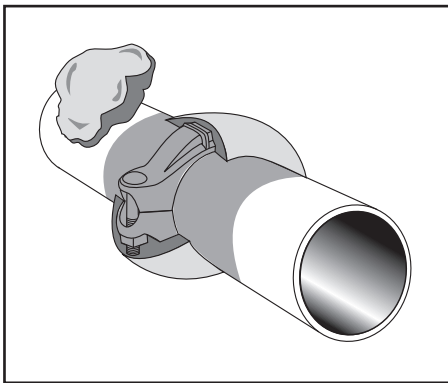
Profiling the joint with PREMIER MOULDING COMPOUND.
